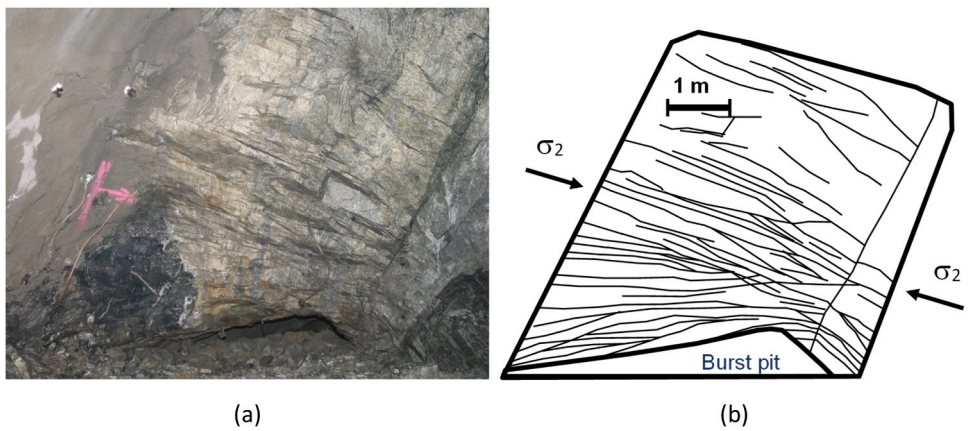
Fractures mapped on the excavation face of a cut-and-fill mining stope.
